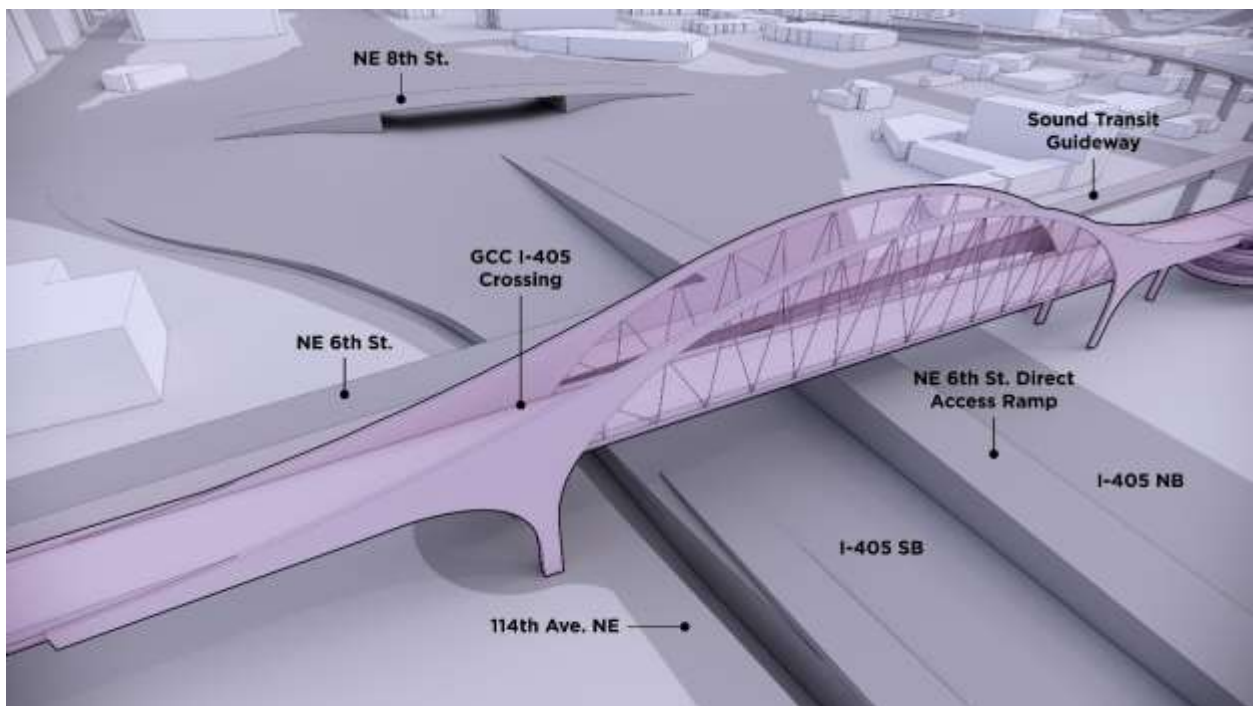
Conceptual rendering of the I-405 crossing structure, network tied arch alternative (looking north).
